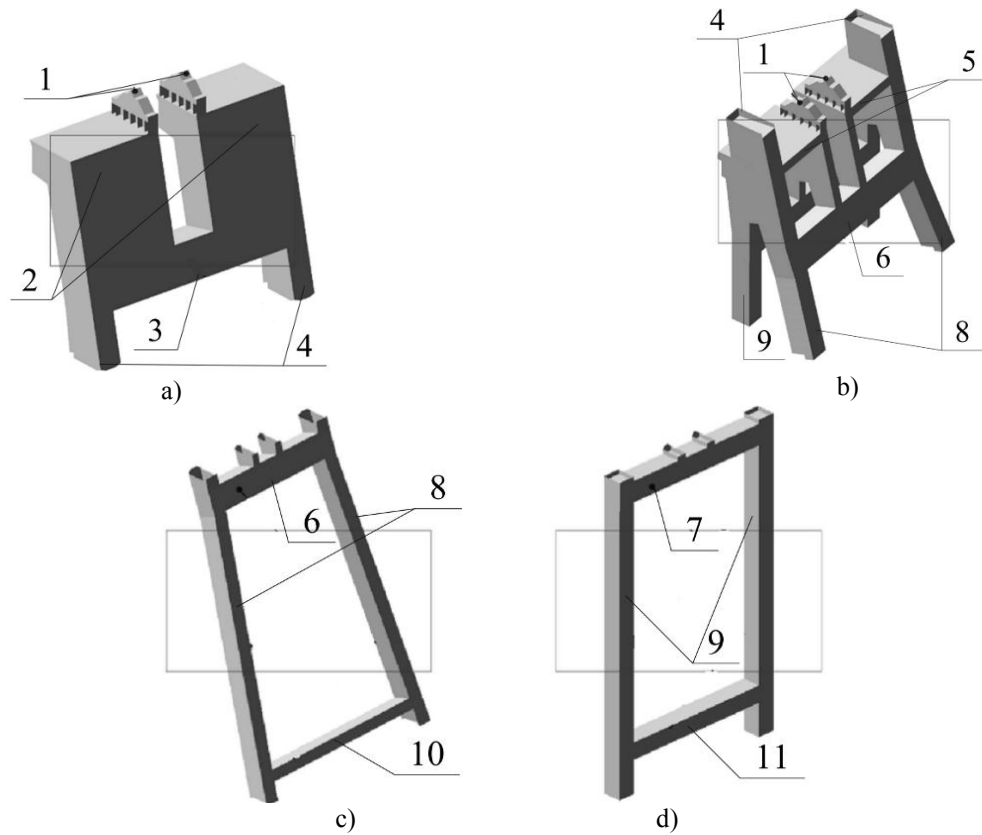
The major joints and elements of a frame-type box-like headgear: a) a segment of the upper sub-pulley structure; b) a segment of the lower sub-pulley structure; c) a segment of the upper part of a stay leg; d) a segment of the upper part of a vertical support (pillar). Component numbering: 1-support bearings of a pulley; 2 – a sub-pulley pillar of the upper sub-pulley platform; 3 – the main girder of the stay leg of the upper sub-pulley platform; 4 – the branches of the stay leg between the sub-pulley platforms; 5 – a pillar of the lower sub-pulley platform; 6 – the main girder of the stay leg of the lower sub-pulley platform; 7 – the main girder of the vertical supports of the lower sub-pulley platform; 8 – the stay leg branches; 9 – the vertical support body; 10 – the stay leg girder; 11 – the girder of vertical supports)
